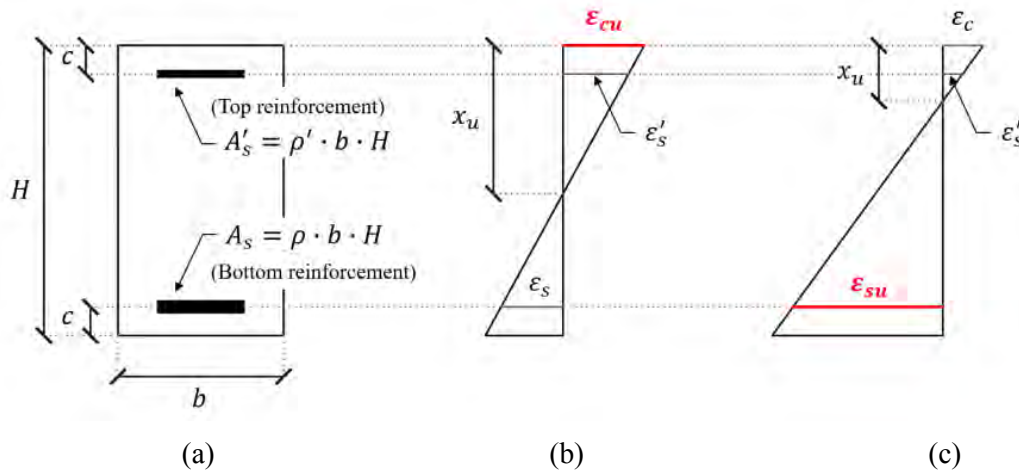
Description of the beam section and definition of strain profiles at ultimate condition. (a) Section geometry; (b) Strain profile at concrete failure; (c) Strain profile at bottom steel failure
